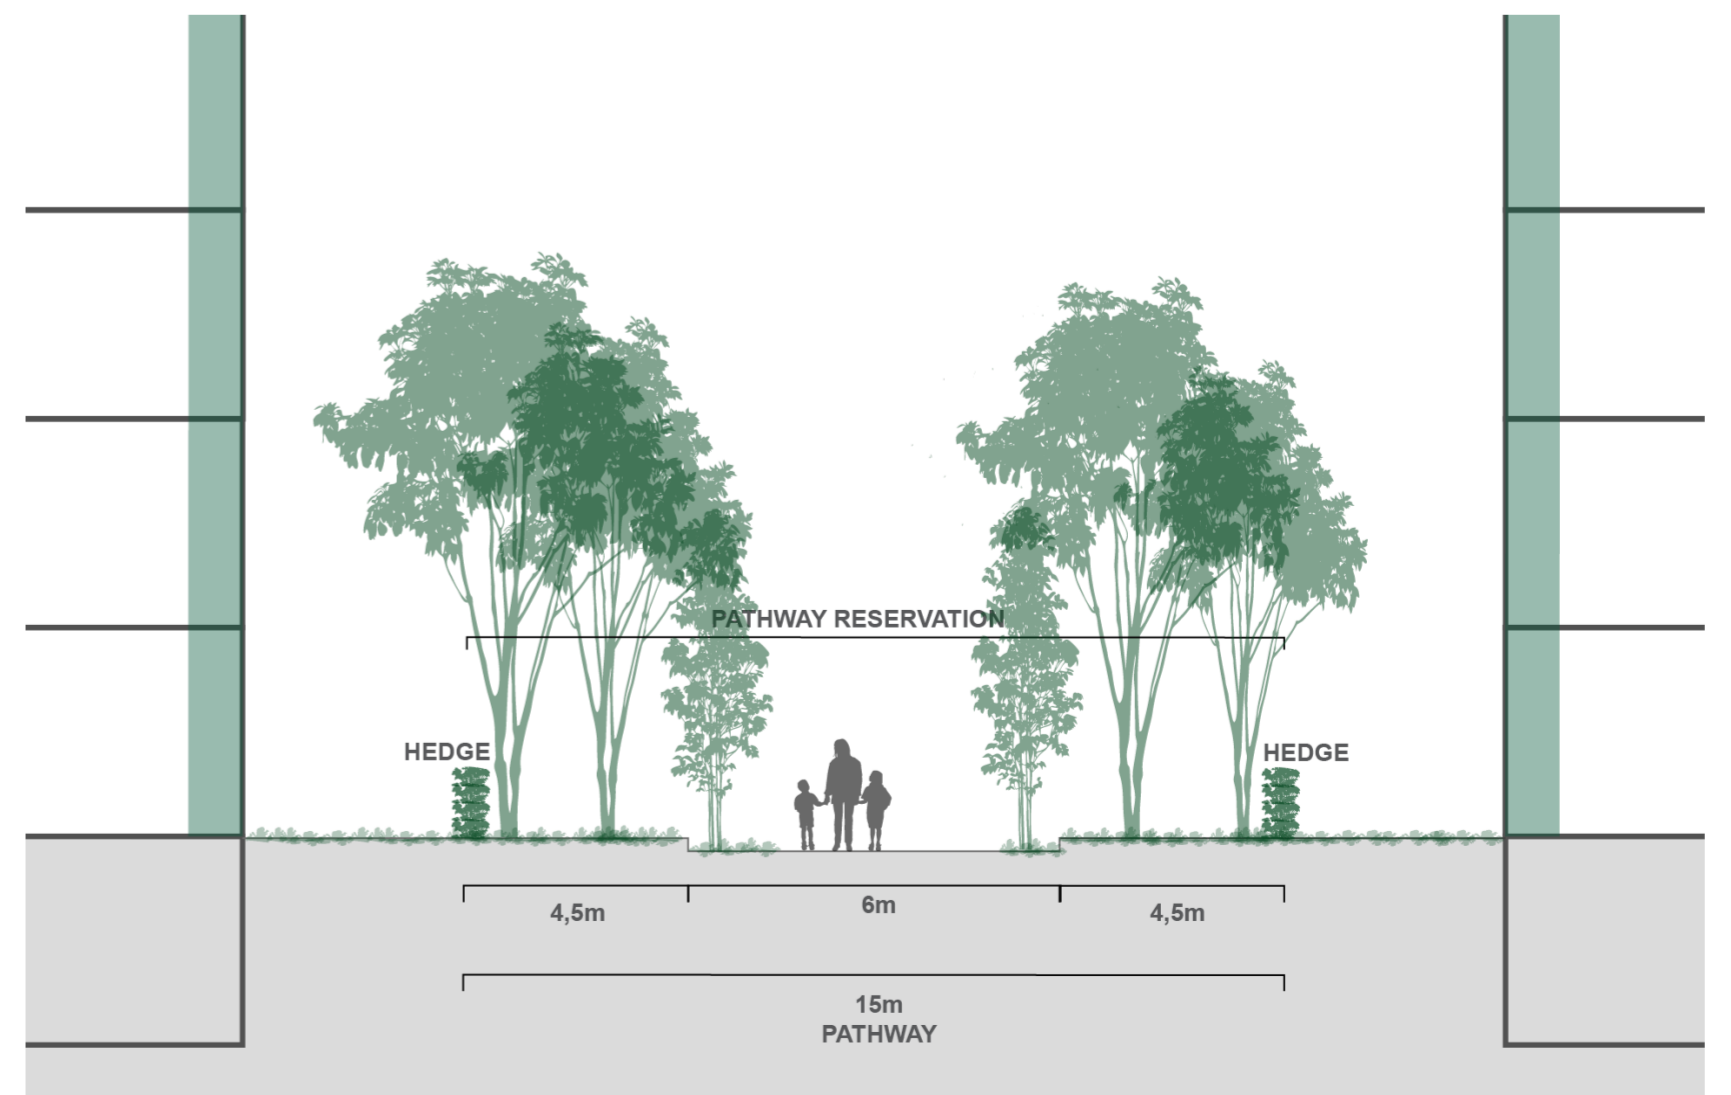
(b) Section of New E-W Path between Holdsworth Avenue & Berry Road (item d.)
